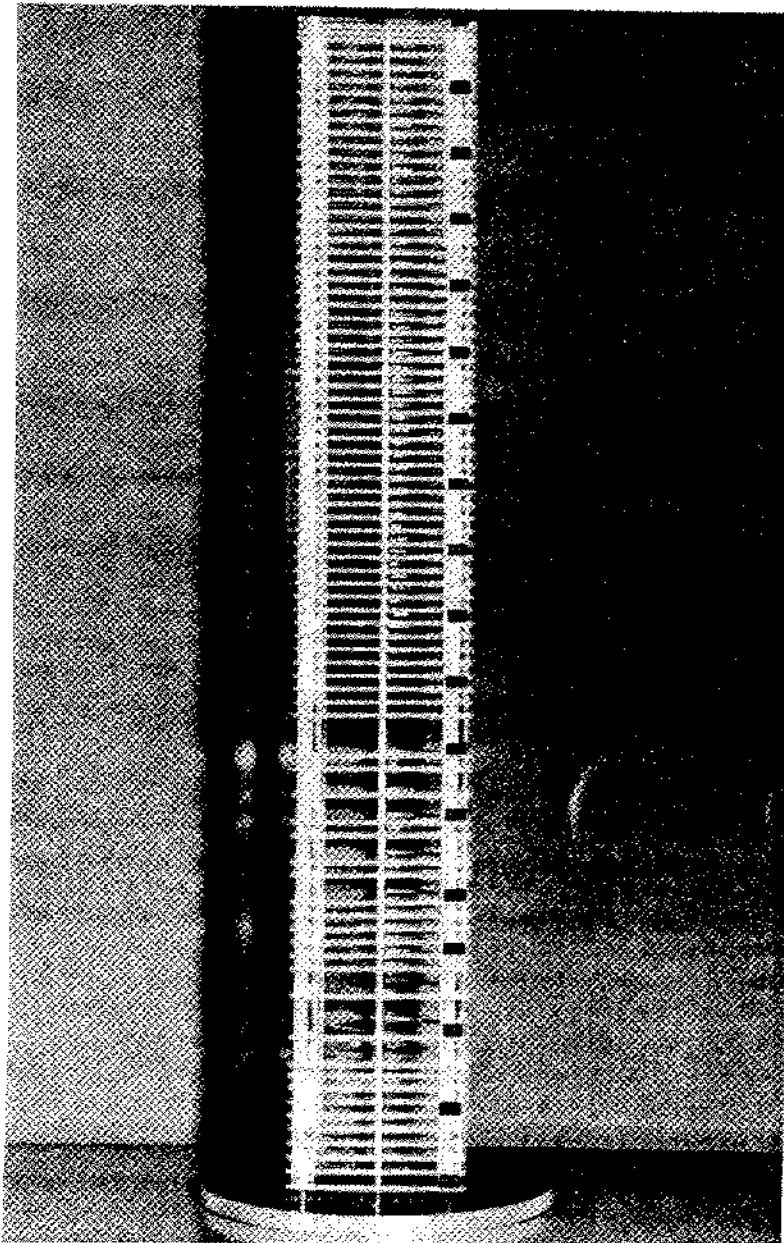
Sonar Caliper model of 72-inch drilled shaft. Such models are useful in determining whether or not casing may be safely lowered into shaft.
